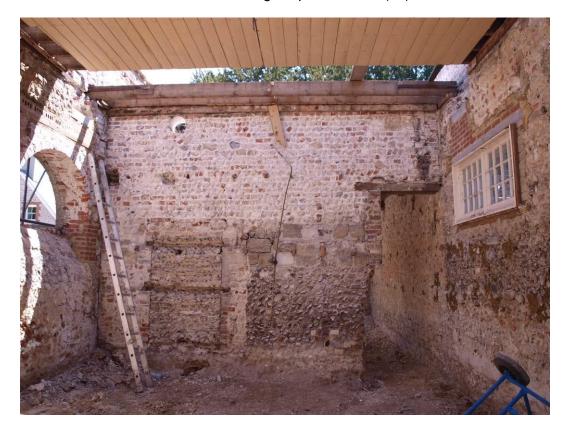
Blocked doorway and area of chalk blocks in a later partition wall forming the south-east wall of Room 5 (12).
